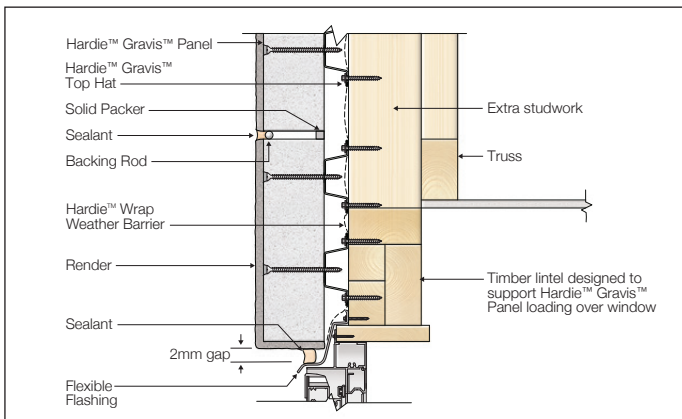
GABLE END WITH LINTEL OVER WINDOW DETAIL
